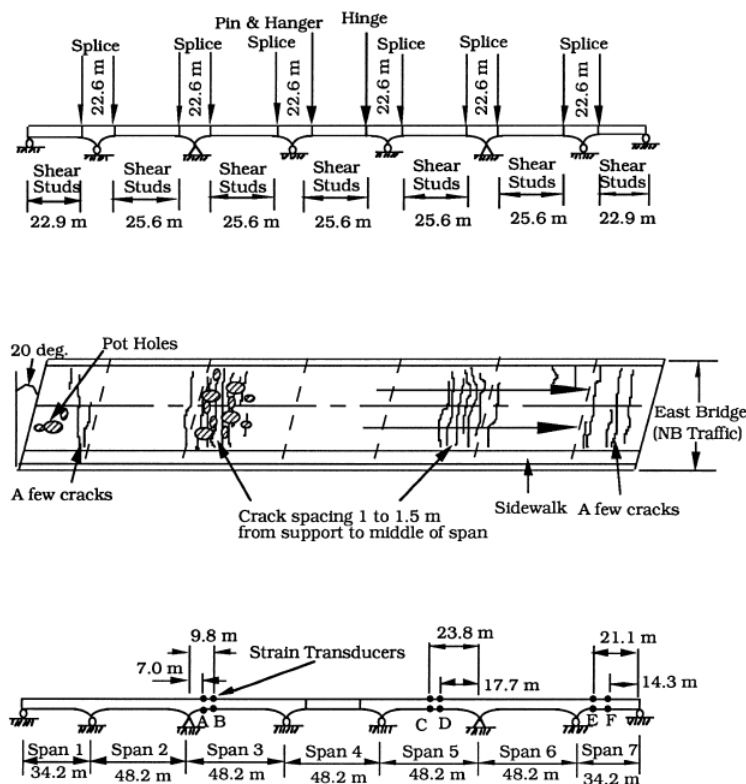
Elevation View of the Bridge, Major Crack Pattern, and Strain Transducer Locations
